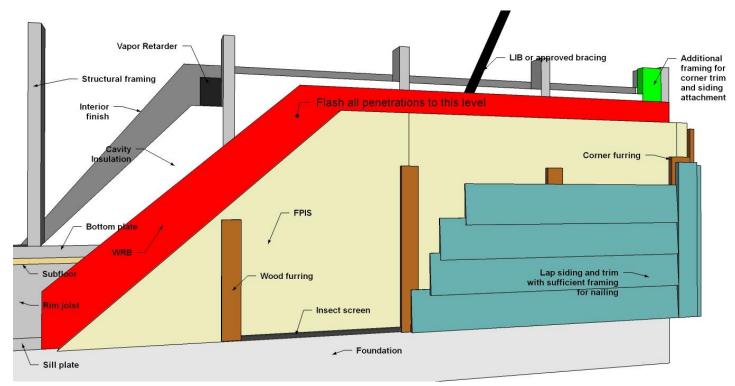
Wood-Frame Wall with Let-in Bracing (LIB) and Exterior Finish of WRB, FPIS, Furring, and Lap Siding
